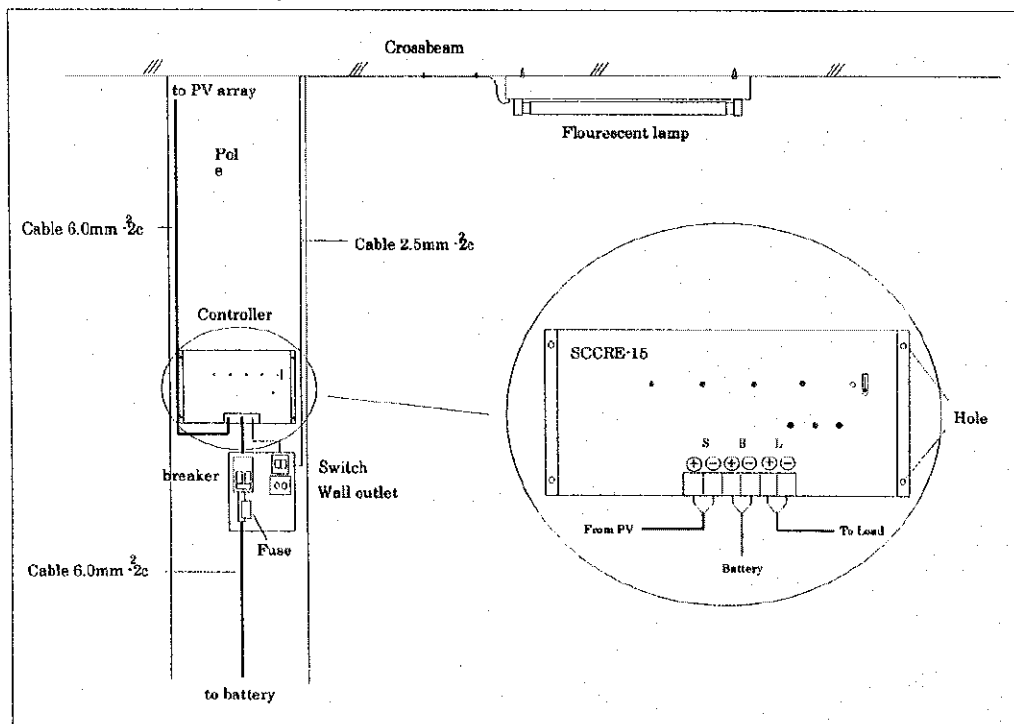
Installation drawing of the controller and other indoor equipment(Example)
